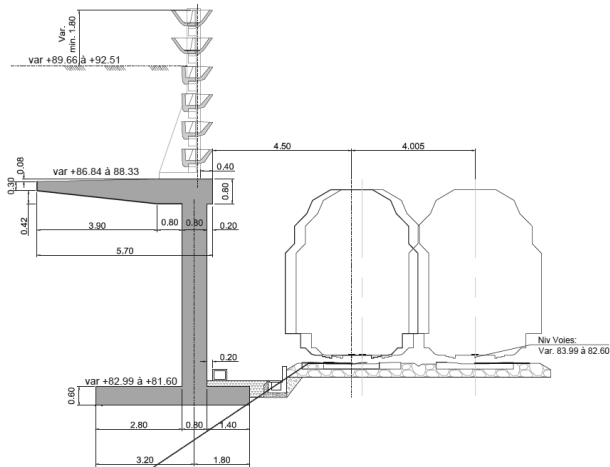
View of the inverted T-shaped cantilever wall with a relief floor of 3.9 m.
